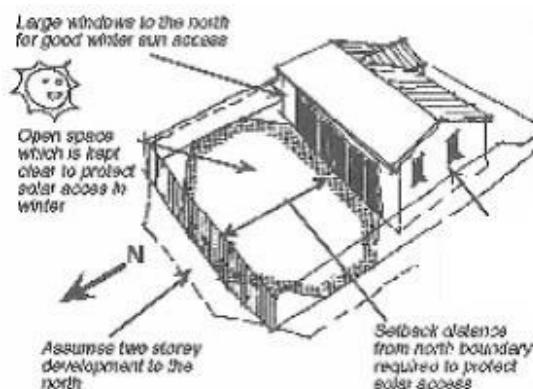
Building orientation should respond to the position of the sun and prevailing winds with larger openings facing north and larger yard space to the north.
